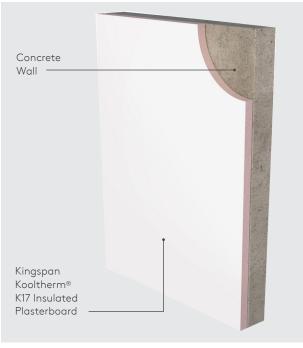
Adhesive Bonding to Concrete Wall (150 mm).
